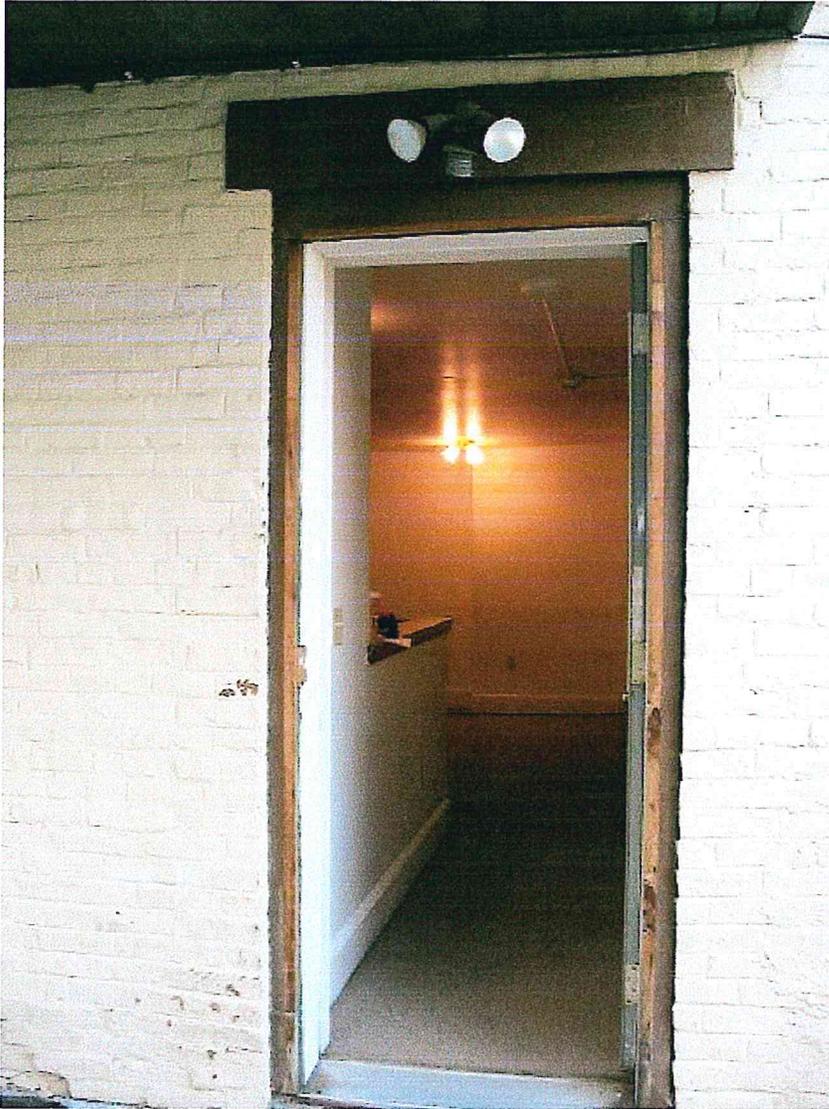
Door to apartment (#4) on east end of first floor. Door frame is modern and bricks have been cut to create this opening.
